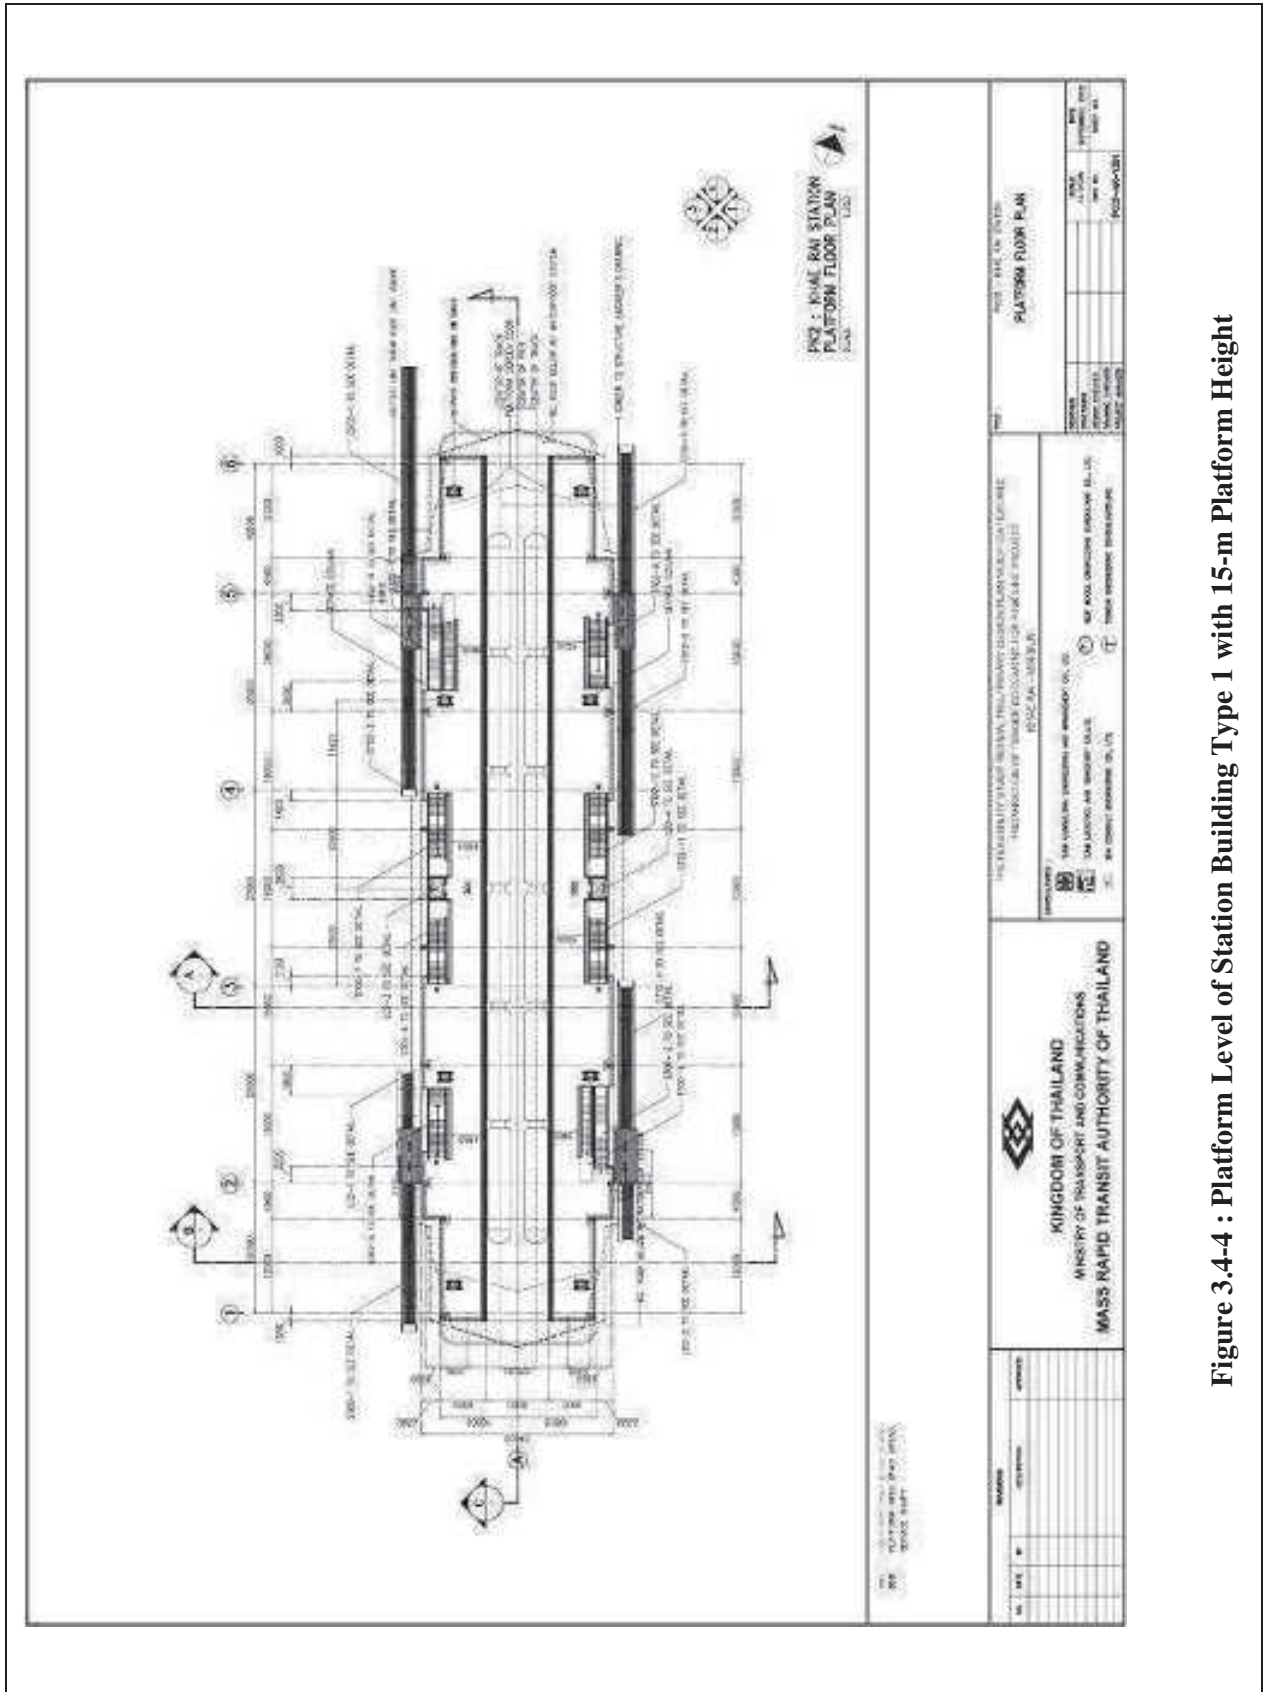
Platform Level of Station Building Type 1 with 15-m Platform Height
